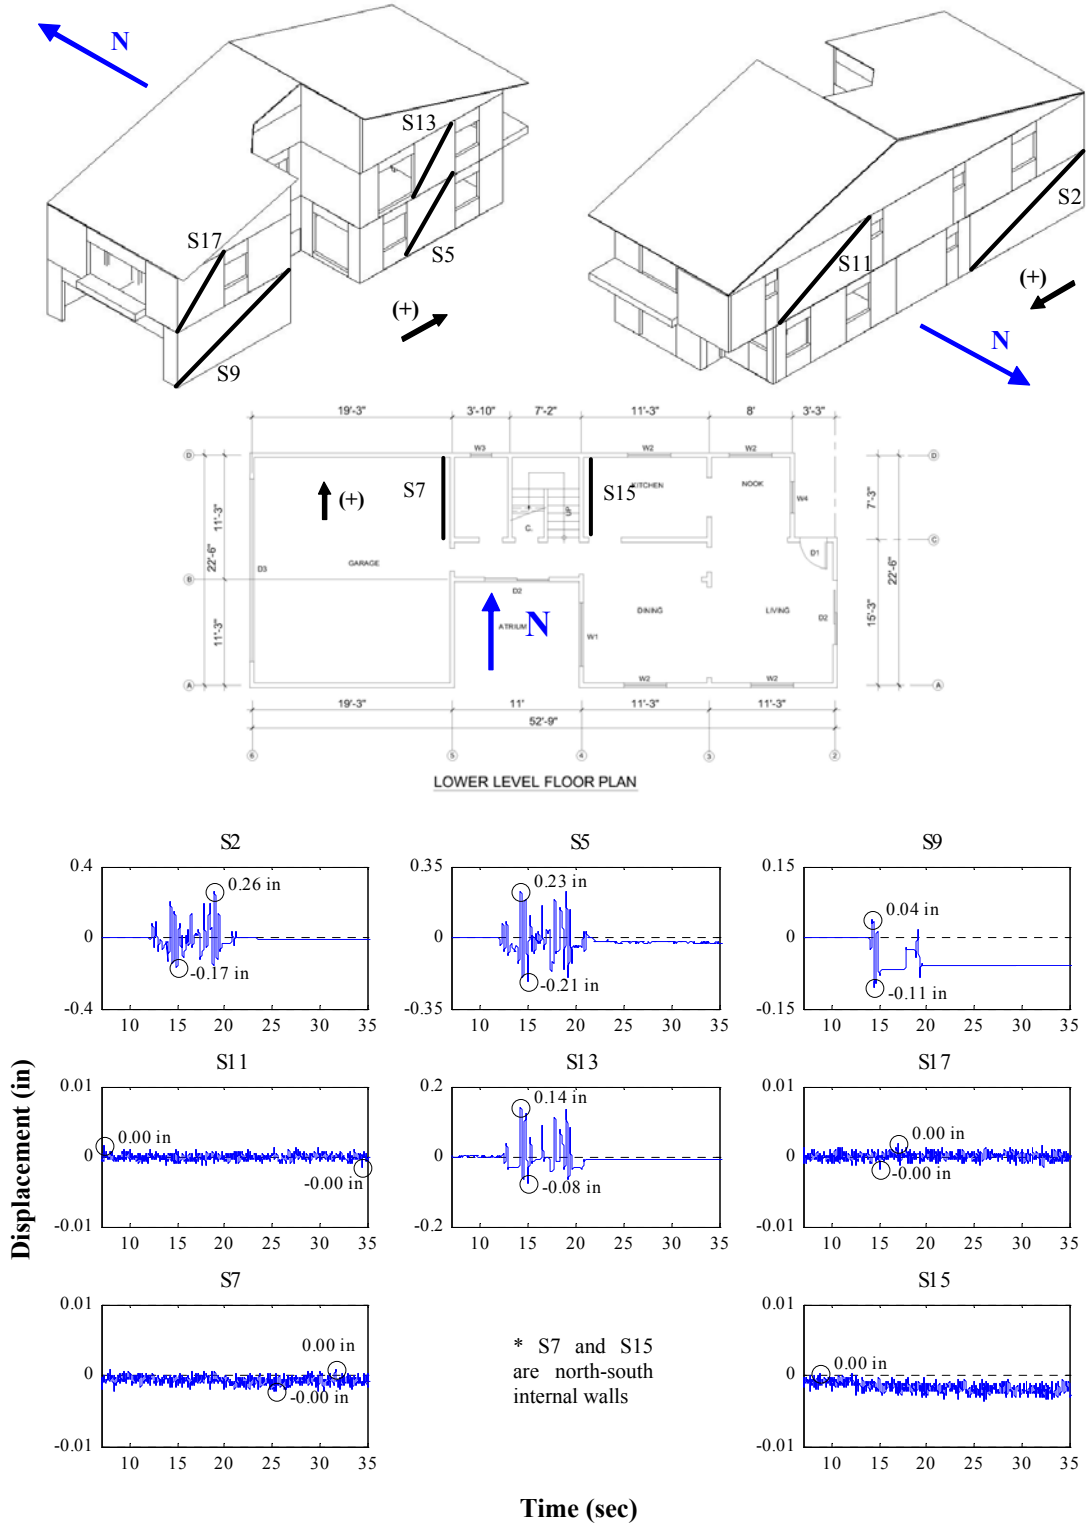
Wall deformations of east-west internal walls for Test NWP2S06
